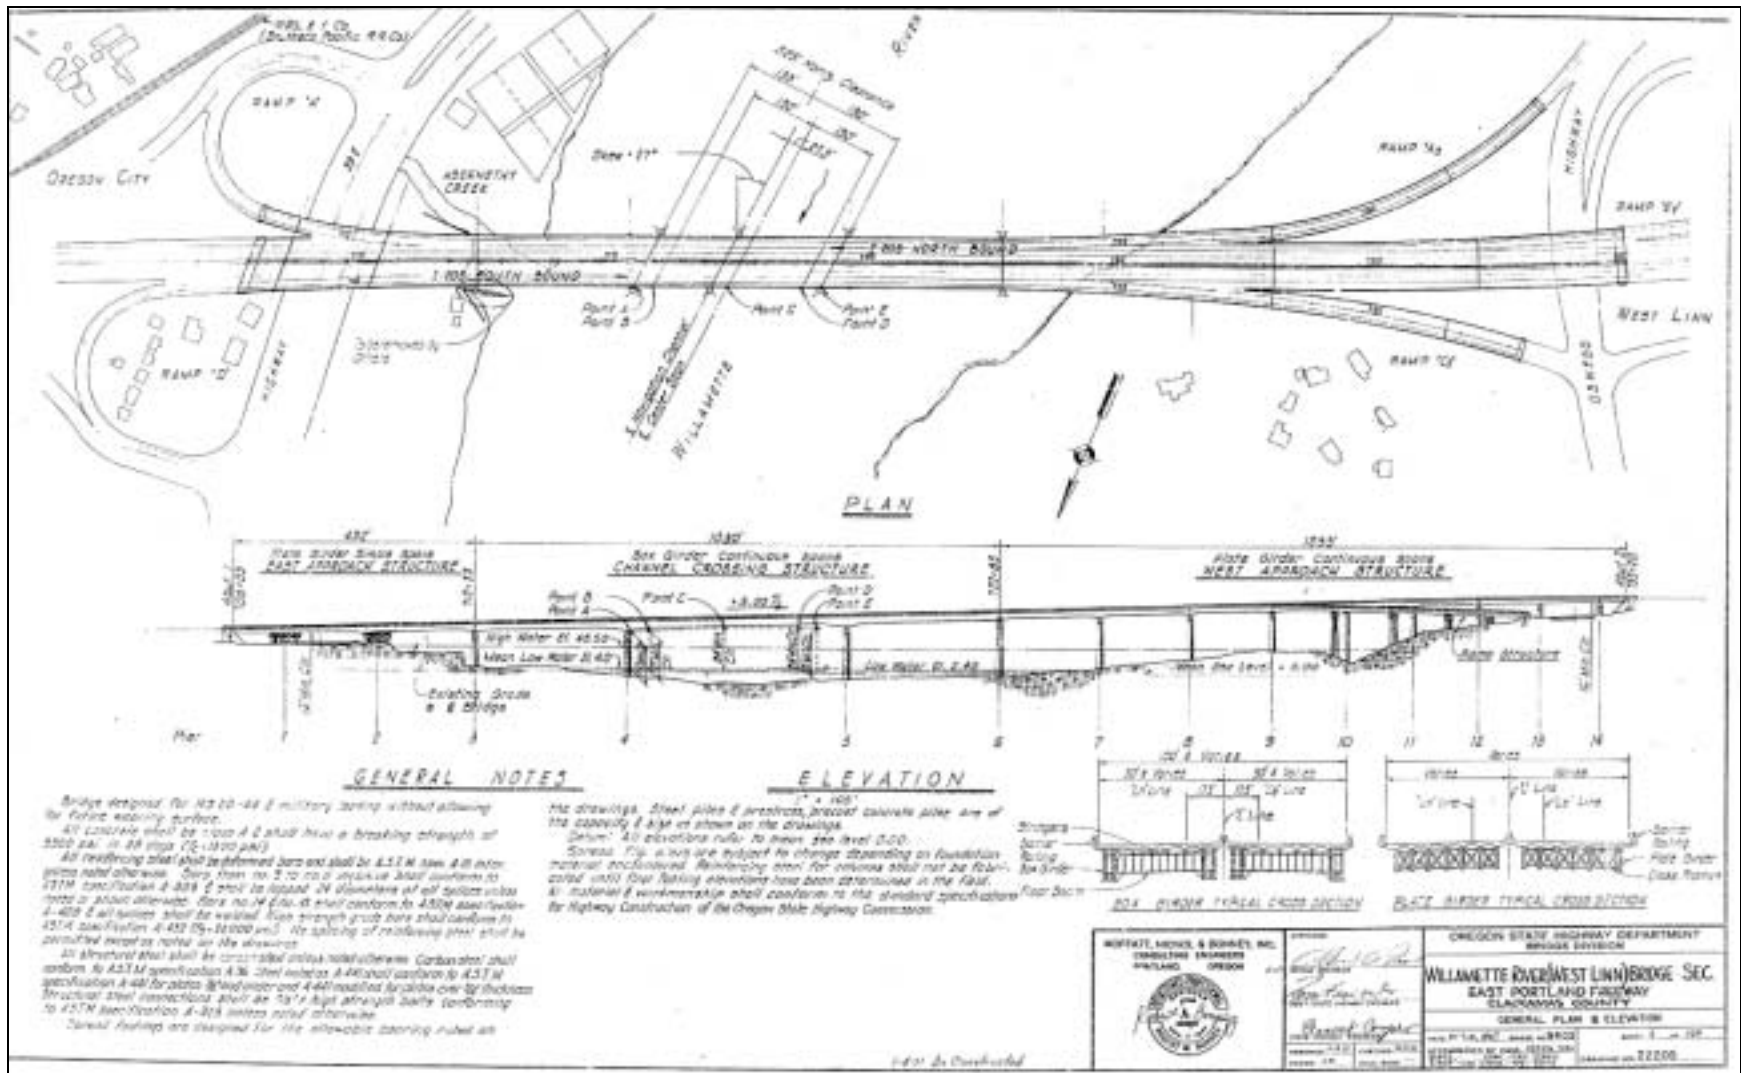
Plan and elevation of the George Abernethy bridge crossing the Willamette river at Oregon City – West Linn, Oregon
